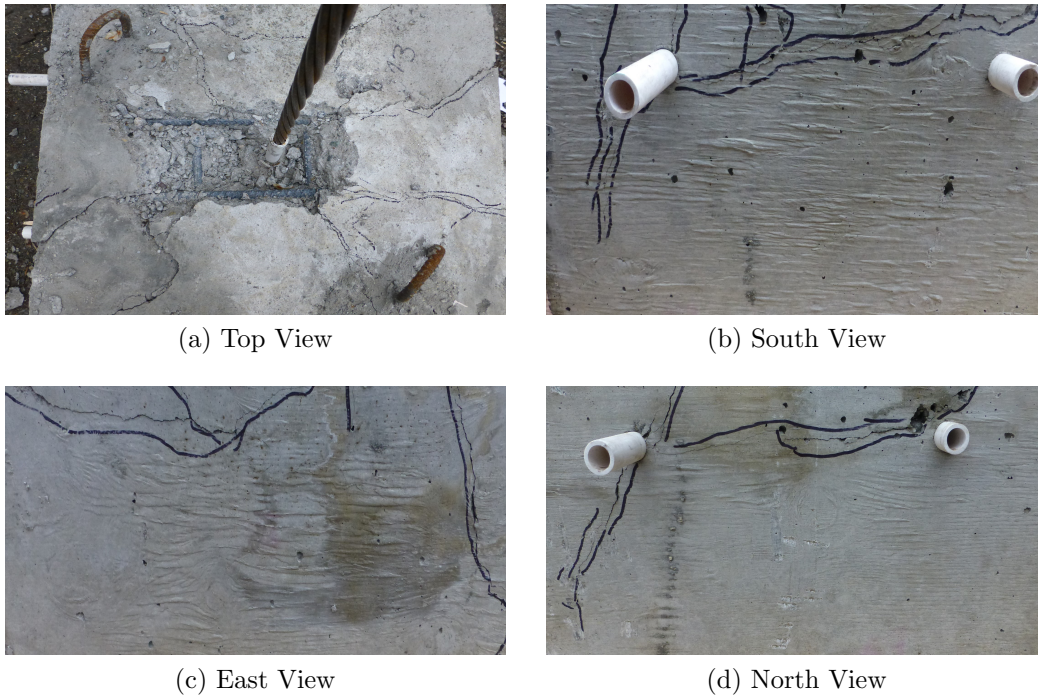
Specimen U_1_O_5.19 Crack Patterns
